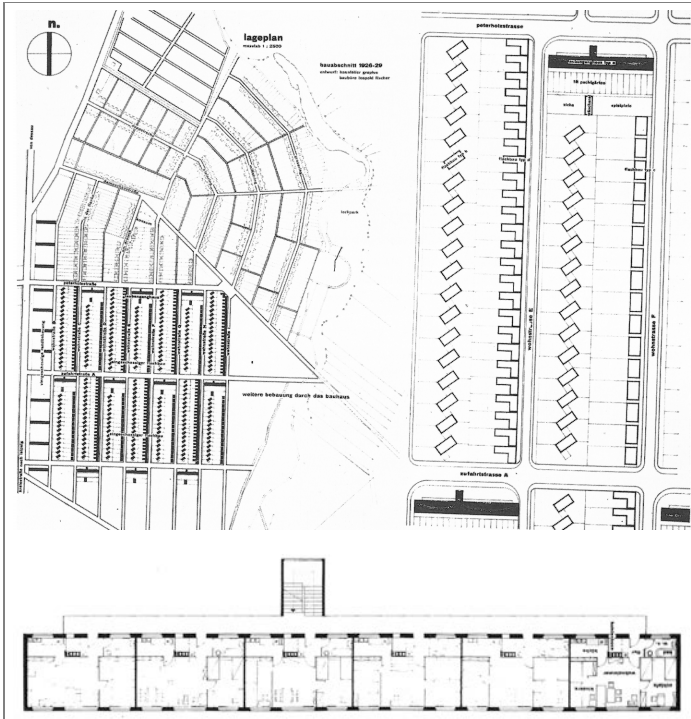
Hannes Meyer and Bauhaus students. Törten estate, second phase, completed 1930. Site plan, detail, and floor plan of balcony-accessed multi-family building. Only four of these apartment buildings were built in the second phase.
